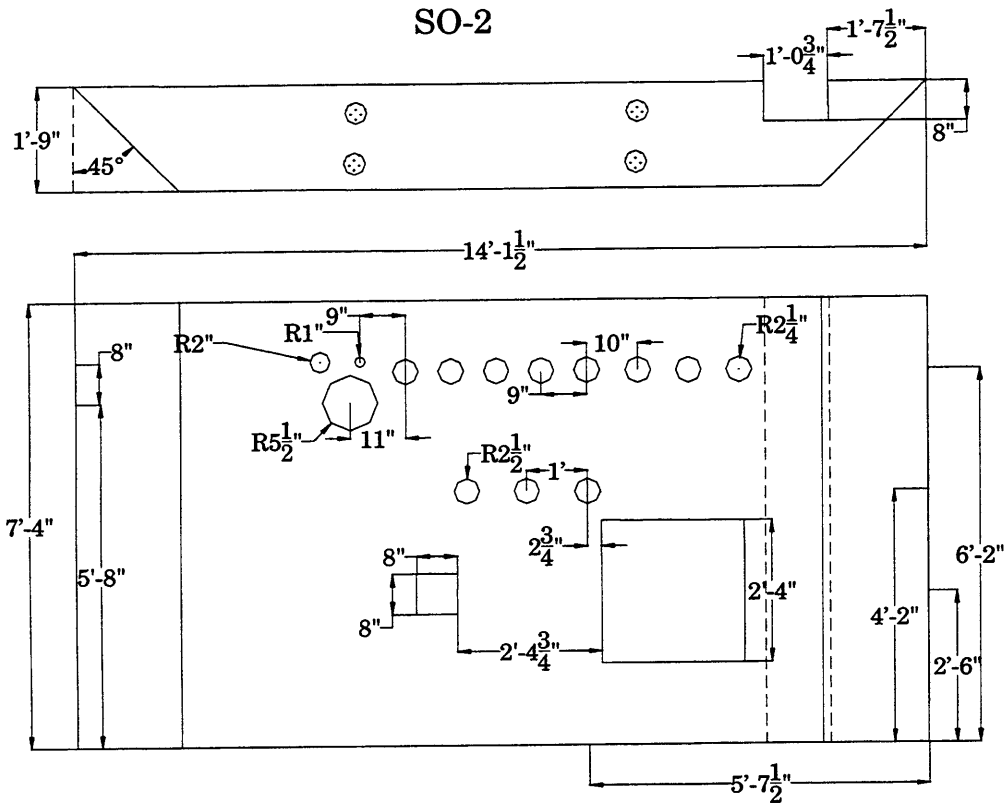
SO-2 will be cut and placed at the outer perimeter of the left wall.
